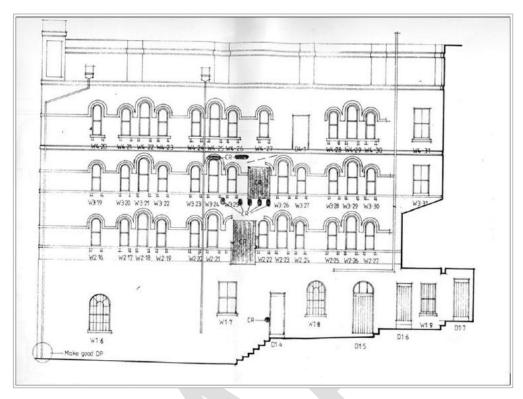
Northern façade of the 1860s wing showing cement render repairs to infilled windows and basement doorway. (Source: SHFA File, No RE 1352.01.01, Drawing No. CP3/27)
